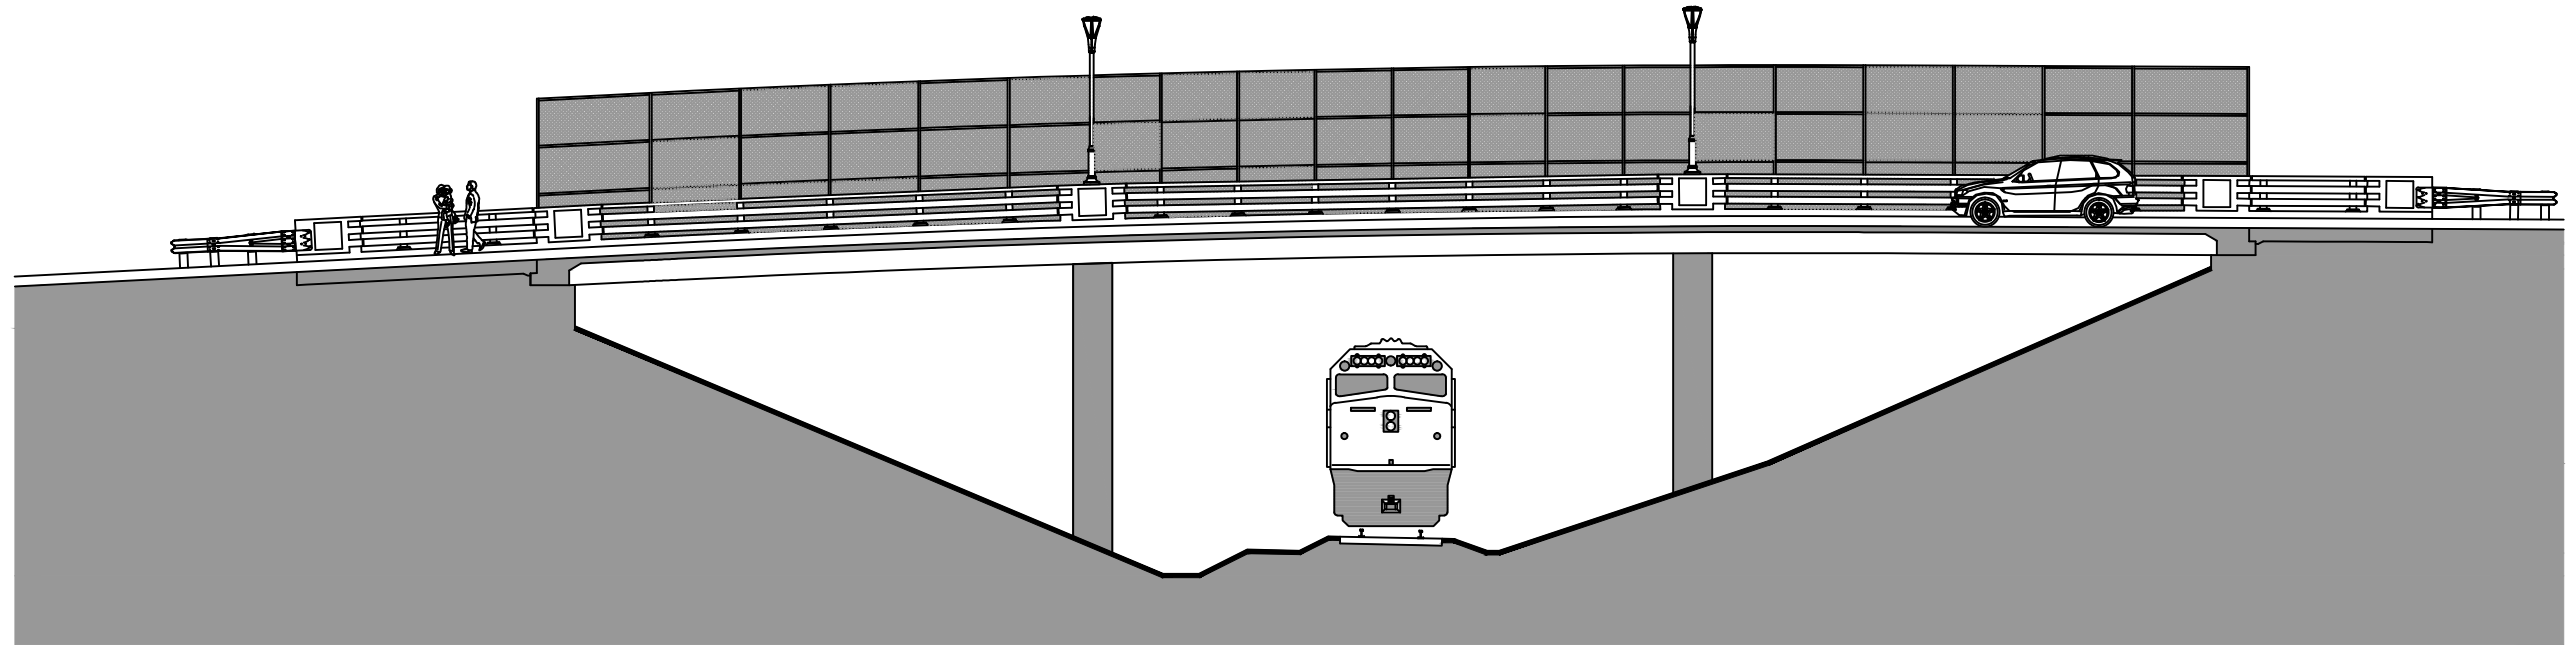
DETAIL - PROPOSED PRELIMINARY ART DECO RAILING & VPF SCREENING
